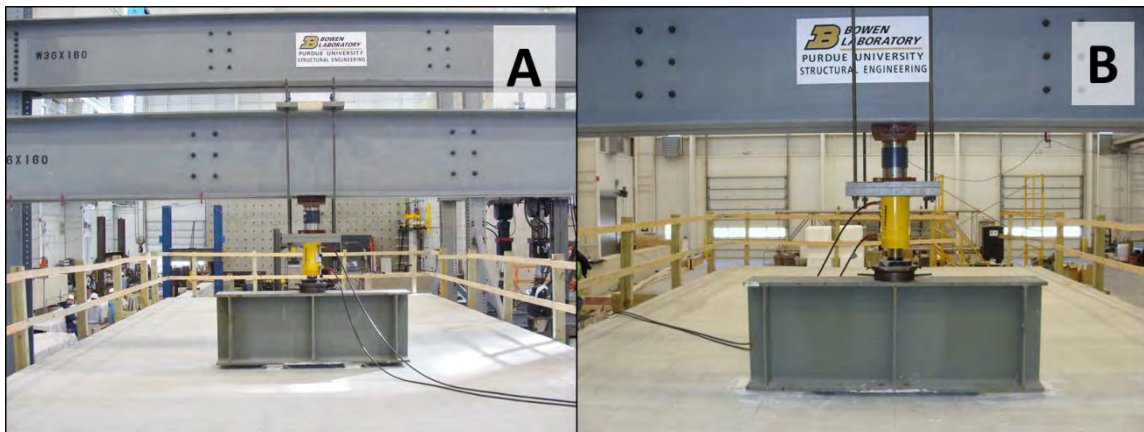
Test 9 (A) & Test 10 (B) (looking south)
